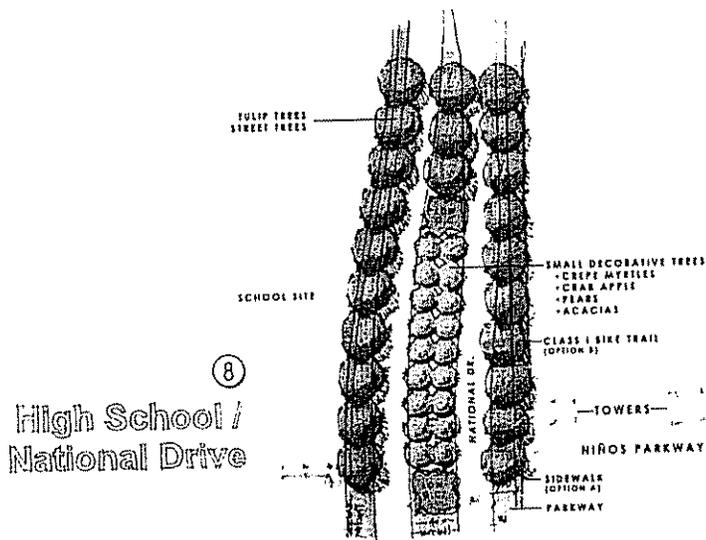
Schematic Landscape Plan 8. High School at National Drive.
